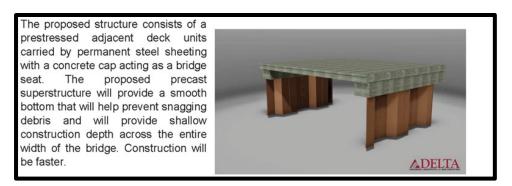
Conceptual Sketch of Proposed Elm Street Crossing in Plan #11
